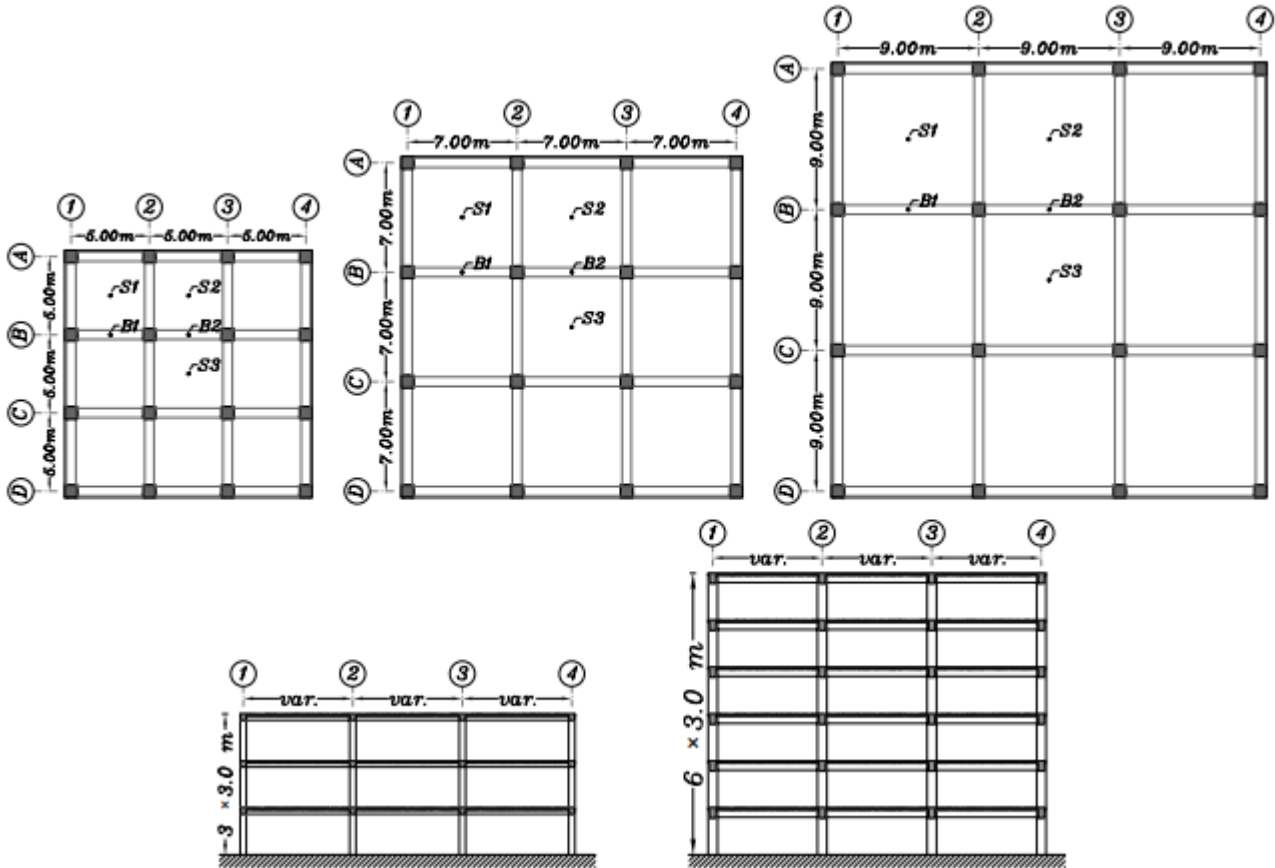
Plan and elevation views of the archetype RC moment-resisting frame buildings and considered critical nodes on the buildings' floor plan.
